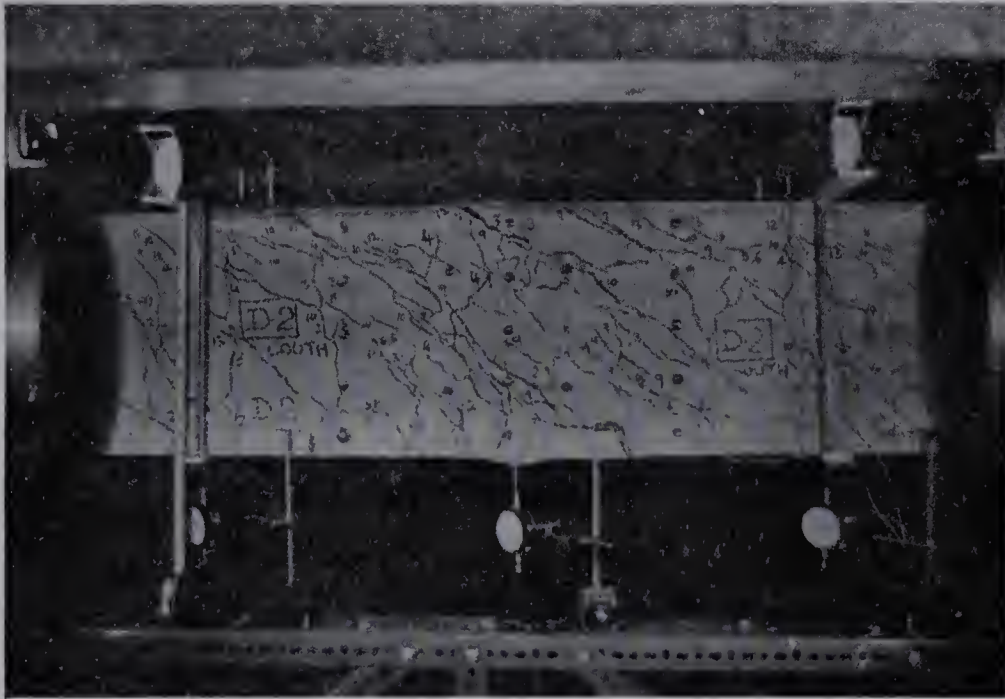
CRACK PATTERN FOR SOUTH FACE OF BEAM D-2
